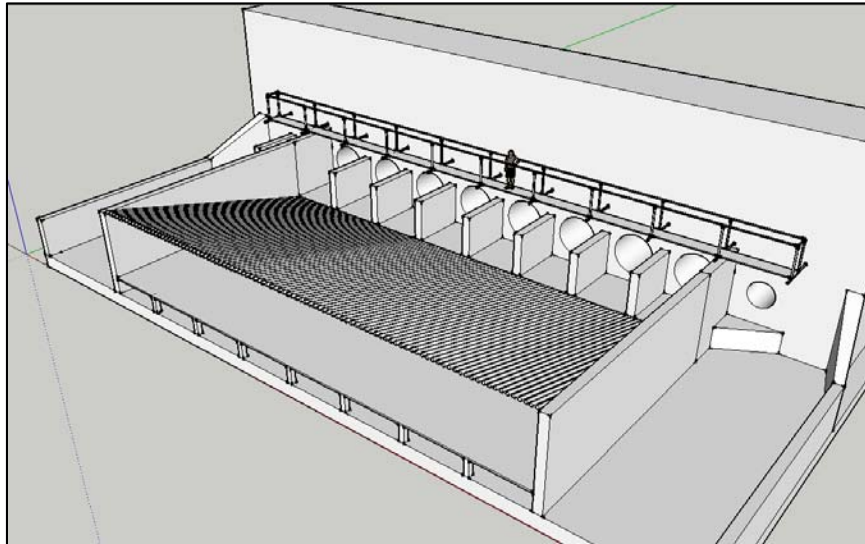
3-dimensional view of features on the downstream side of KLOG with two raised side walls, a raised floor, the concrete bullnose remaining and a picket weir at the base of the existing gate walls.
